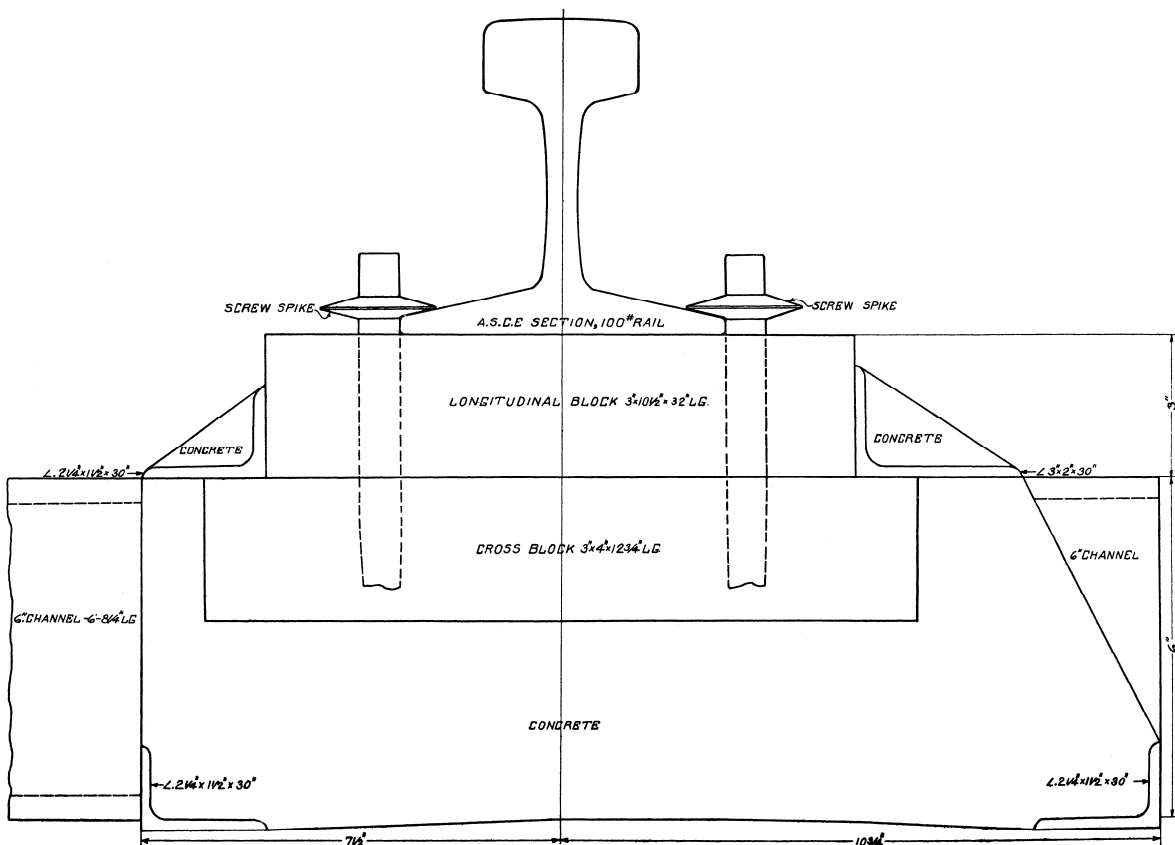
The International Steel Tie, a combination of steel frame, concrete filler, and wood rail seat, in the form of a ladder track, installed on the Pittsburgh & Lake Erie Railroad (AREA 1912)
